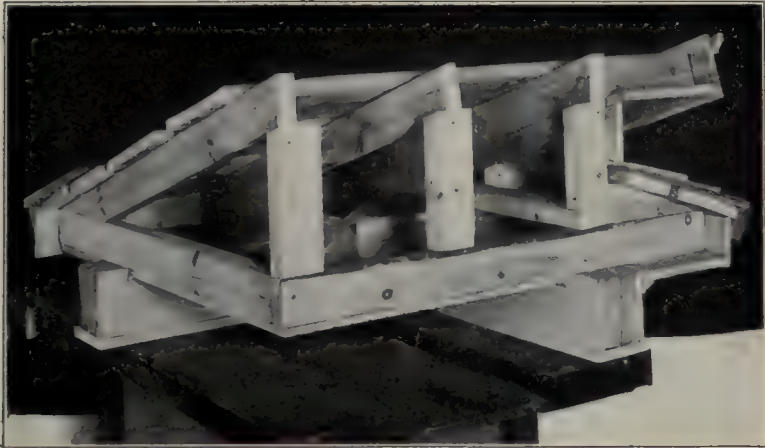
PORCH CONSTRUCTION, SHOWING FRAMING.
